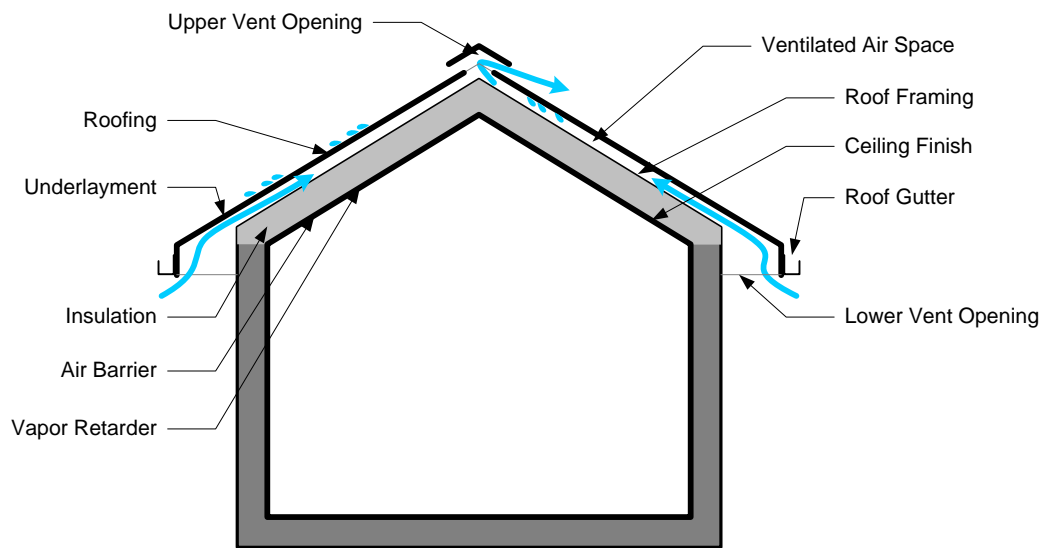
Ventilated cathedral ceiling roof assembly
